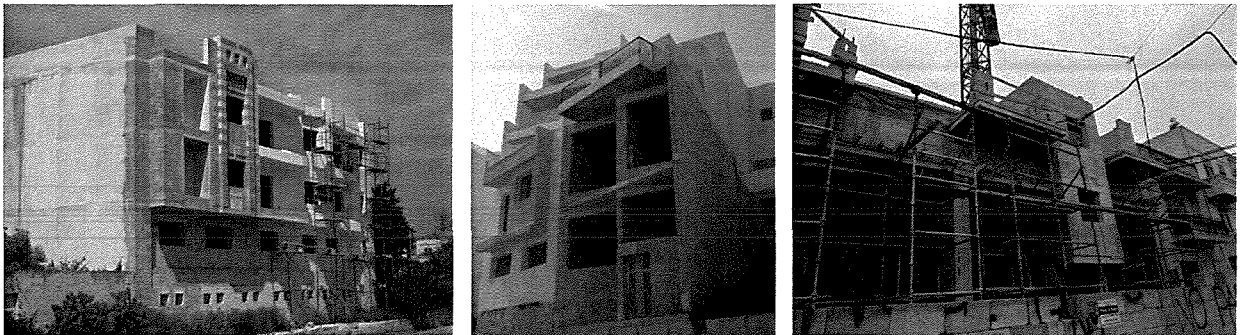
Typical local buildings with construction mainly of concrete and stone masonry
